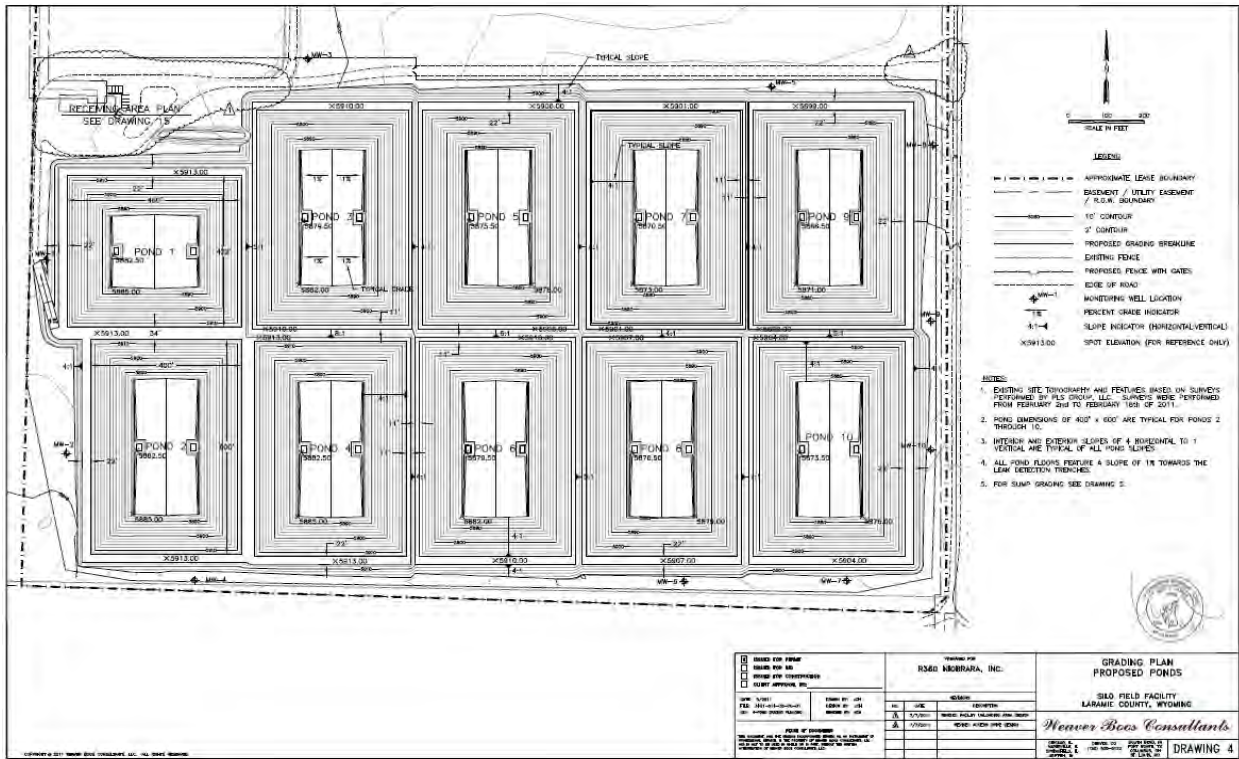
Silo Field - Facility Design Plan View – Permit Approved Layout
